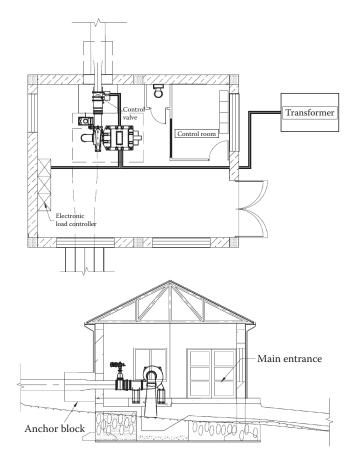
Plan and sectional view of a typical micro hydropower plant.
